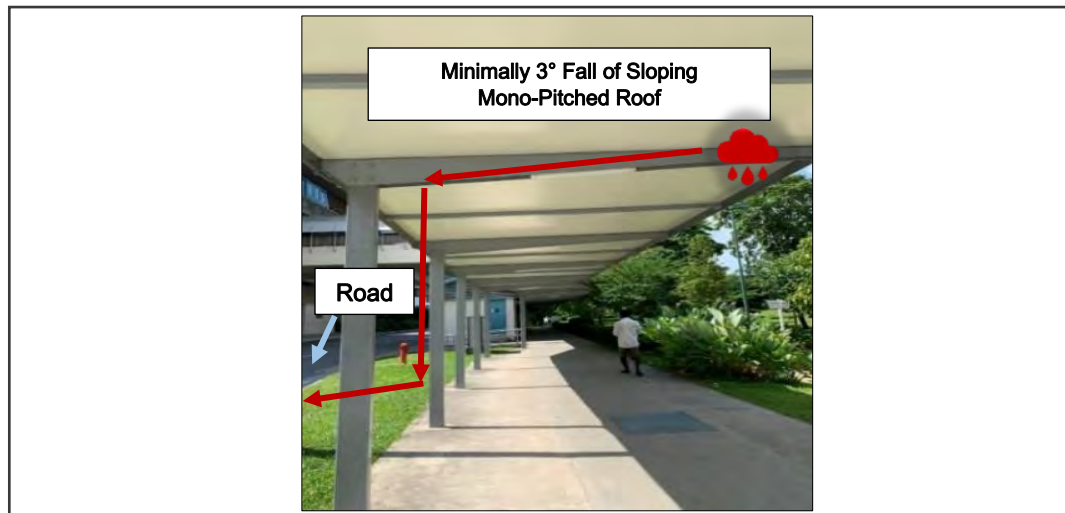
Minimally 3° Fall of Sloping Mono-Pitched Roof of Covered Linkway
